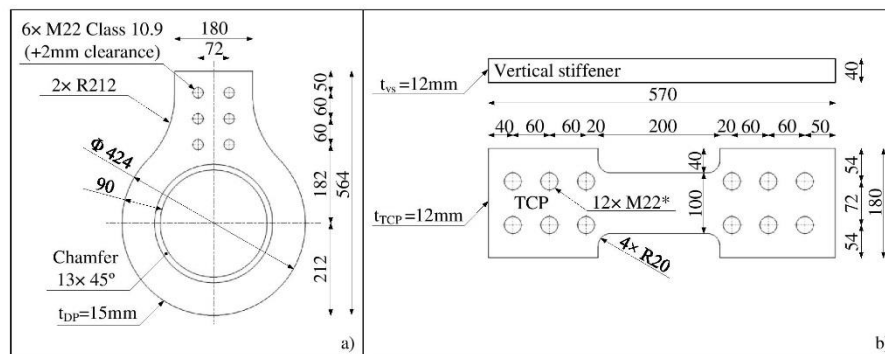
Geometry of a) Diaphragm plate; b) Tapered cover plate and stiffener (all dimensions in [mm])
